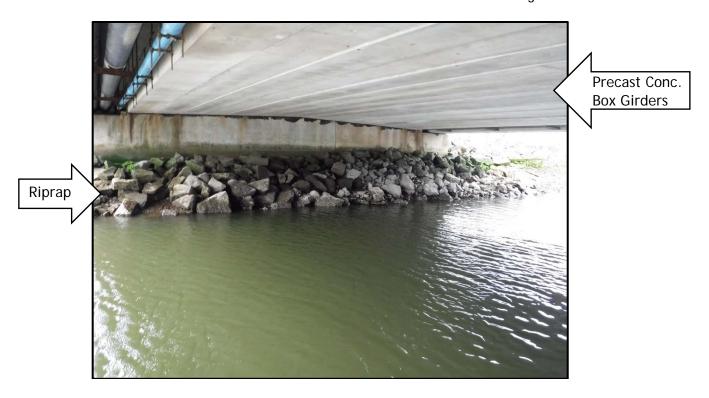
Grand Avenue Bridge over the East Branch of the Mill River, looking west, photo taken March 18, 2016.
